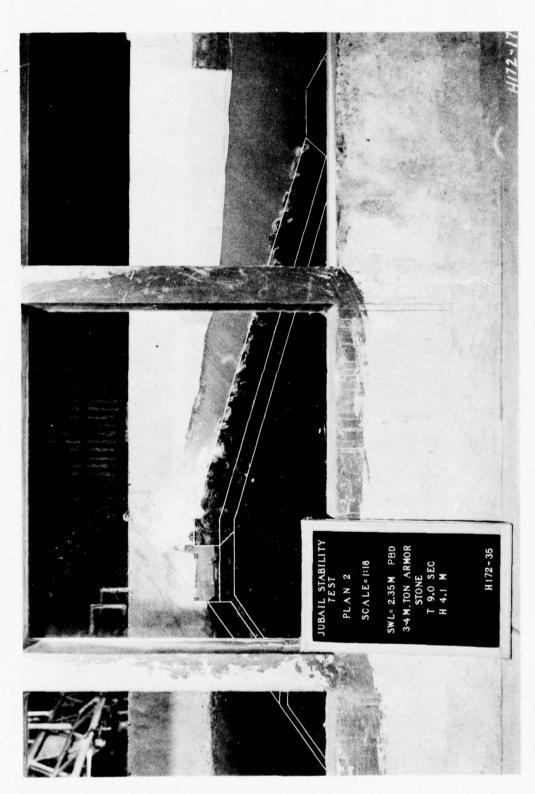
End view of Plan 2 under attack by 9-sec, 4.1-m waves at a swl of +2.35-m PBD
